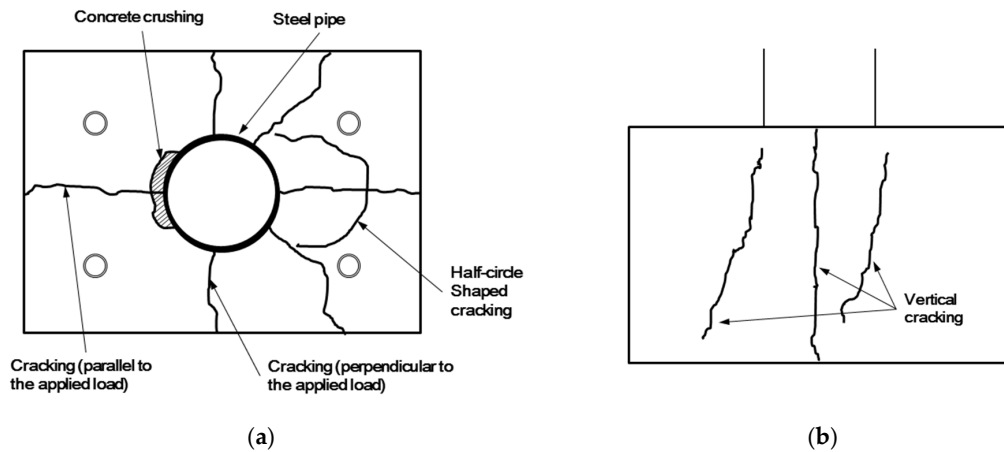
Typical cracking patterns of test specimens. (a) Top surface of the concrete block; (b) Side surface of the concrete block.
